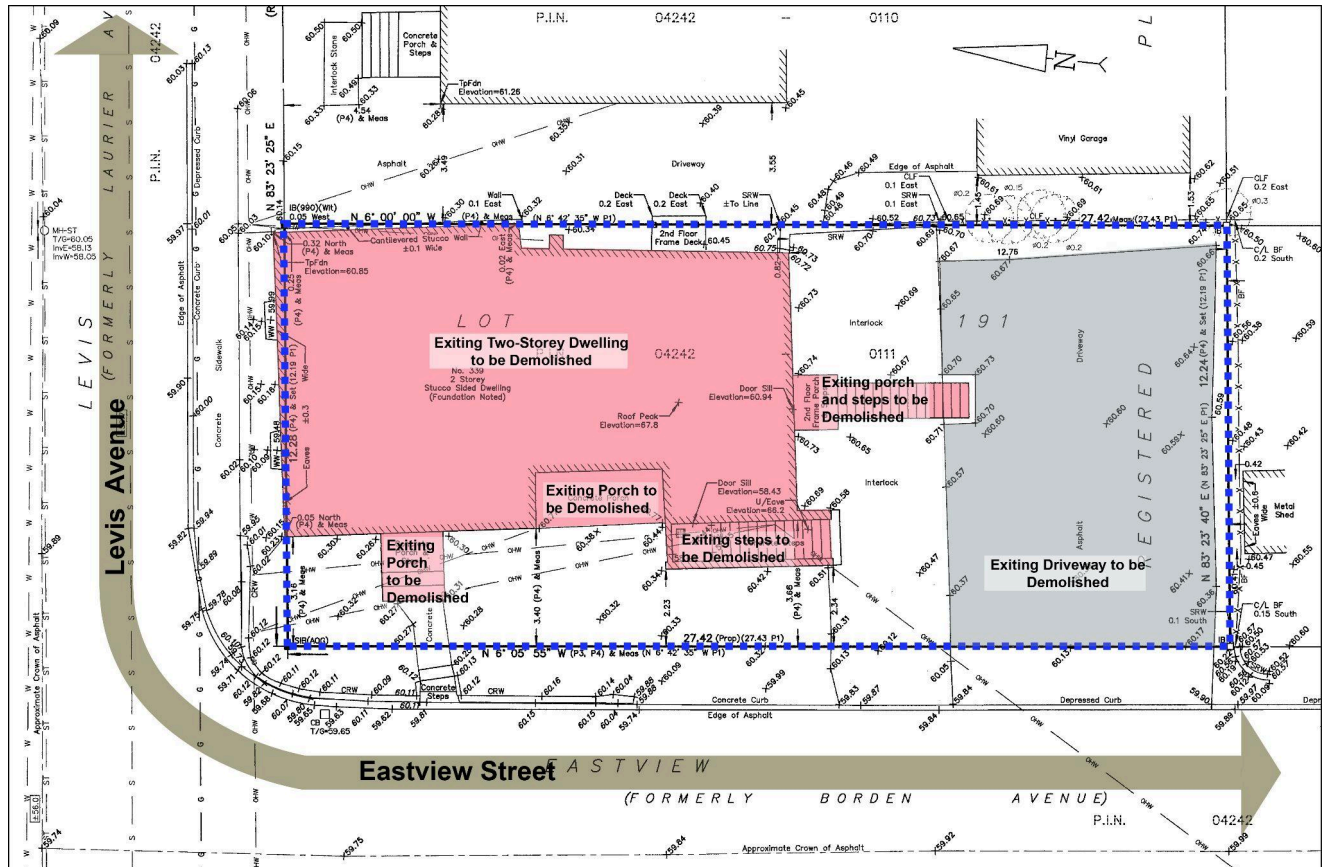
Survey Plan showing *Property boundary, existing dwelling and driveway to be removed, completed by Farley, Smith & Denis Surveying Ltd, December 2024.
